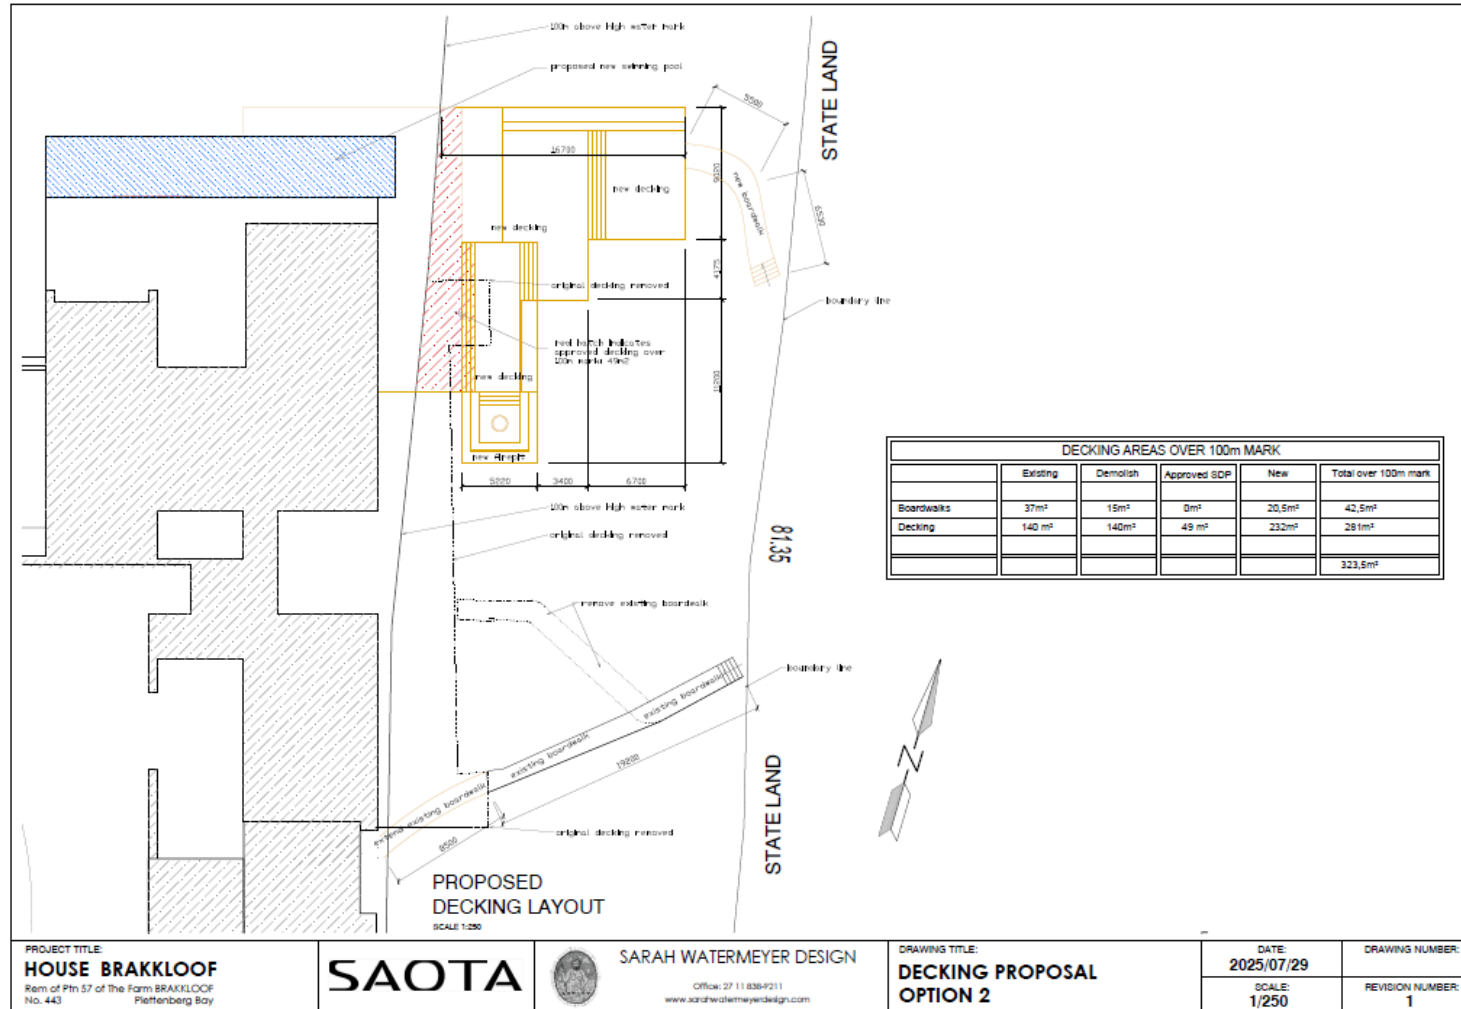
Preferred Site Development Plan – see Annexure 1 for full size plan
